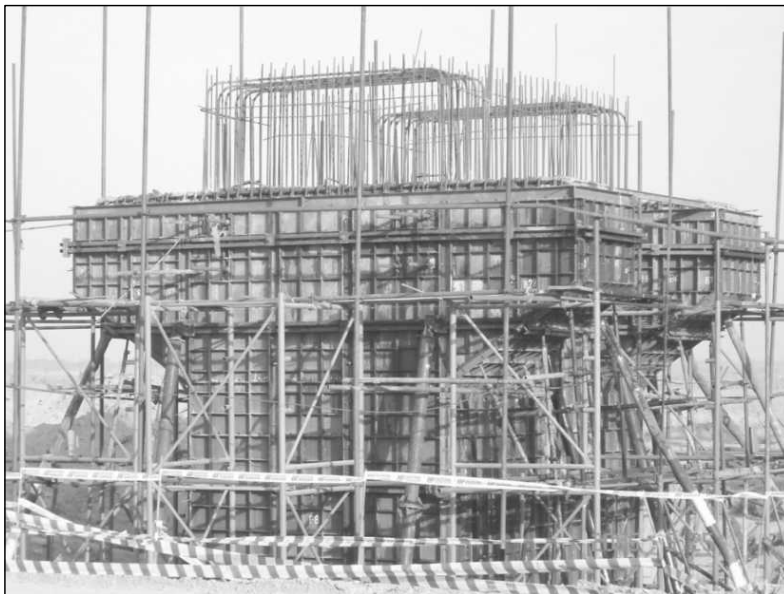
Formwork Arrangement for Pier and Pier Cap for a Bridge Project in Delhi.
